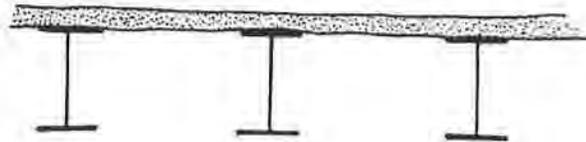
Spaced Beam-and-Slab Decks with Steel I-beams and Concrete Slab (16)
